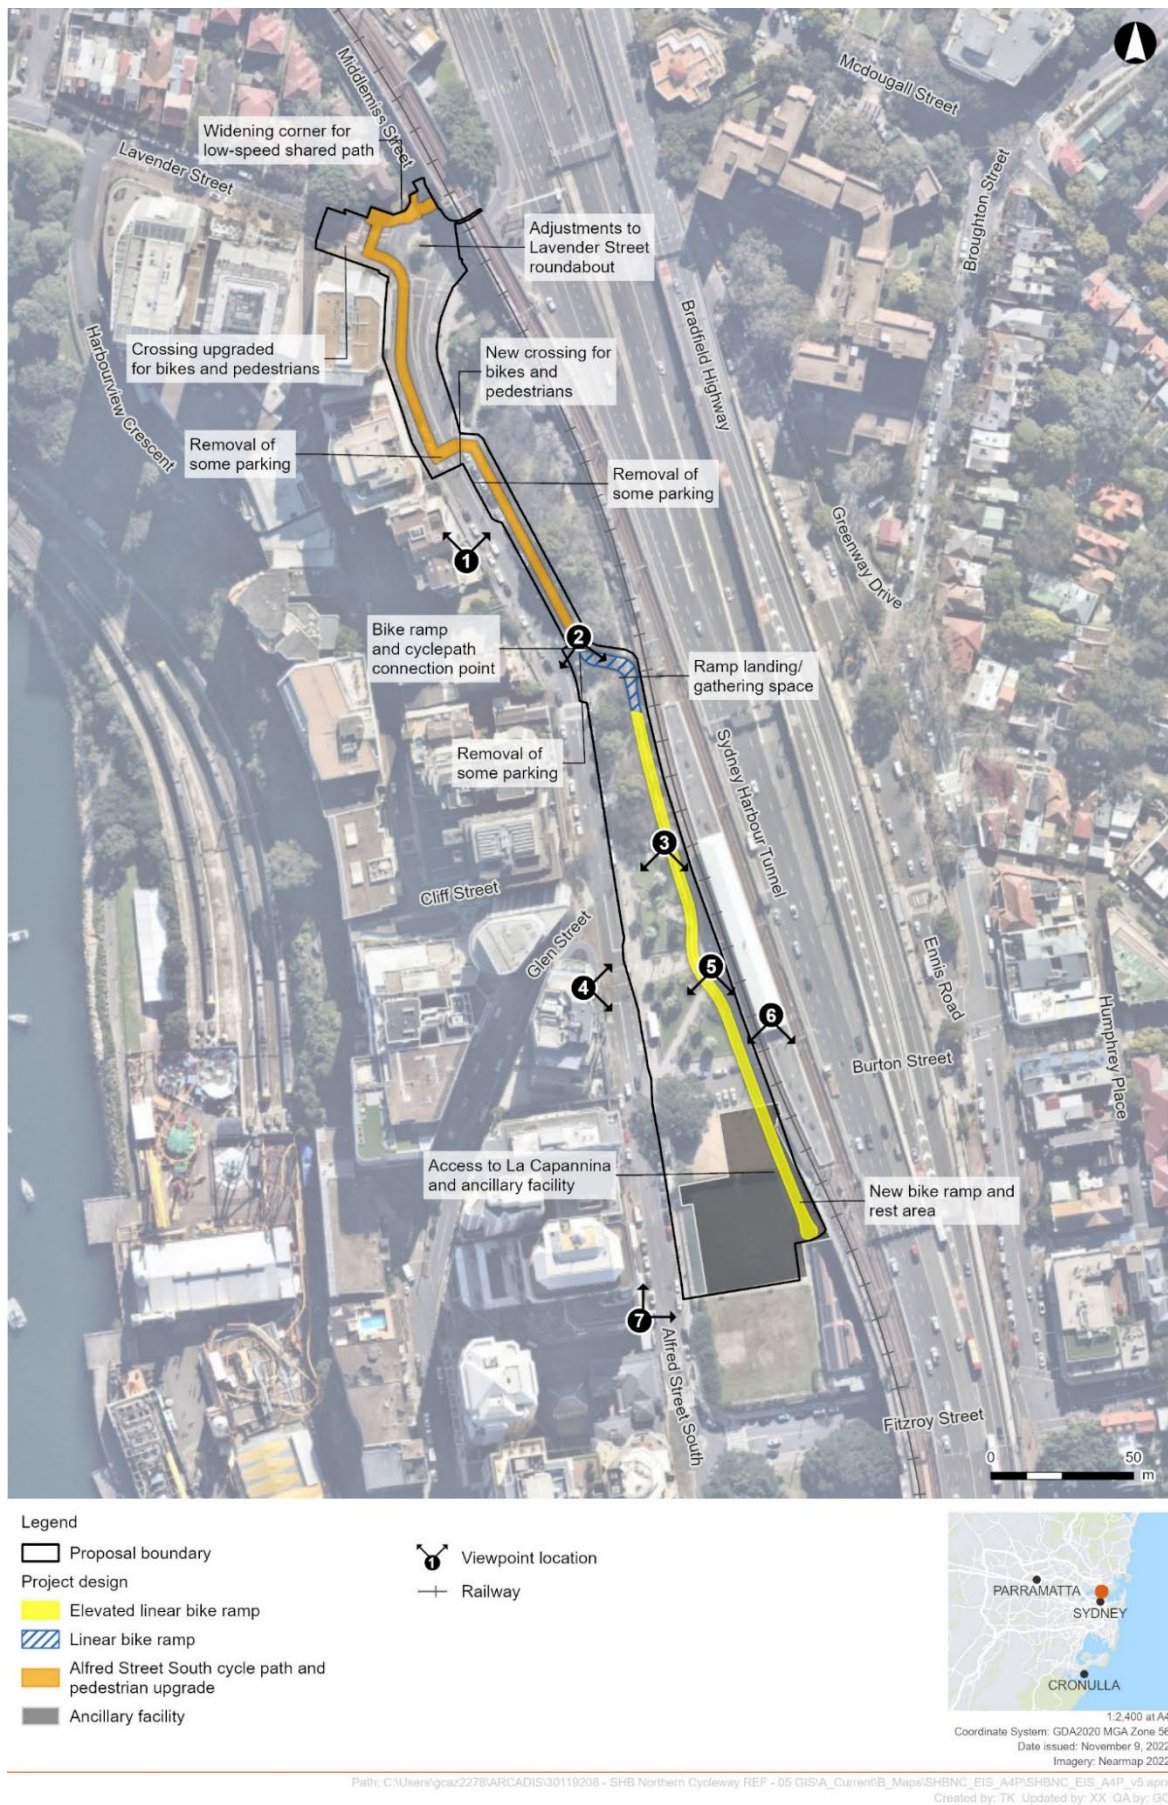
VIEWPOINT LOCATION PLAN
